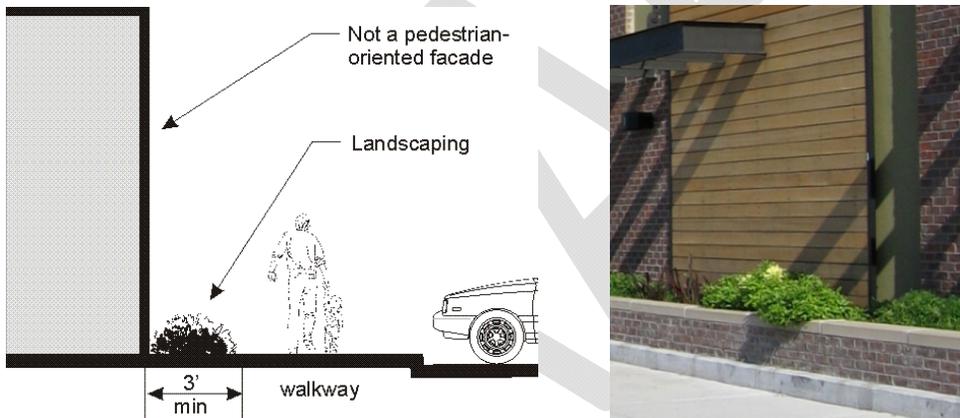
Acceptable and unacceptable internal walkways.
